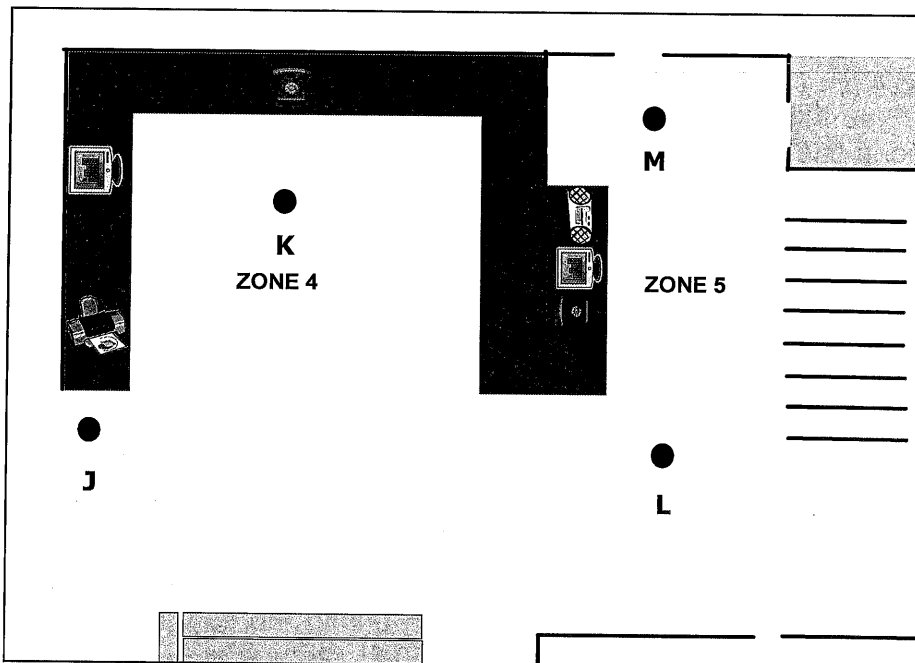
Floor plan zones 4 and 5. Sampling sites (●).
